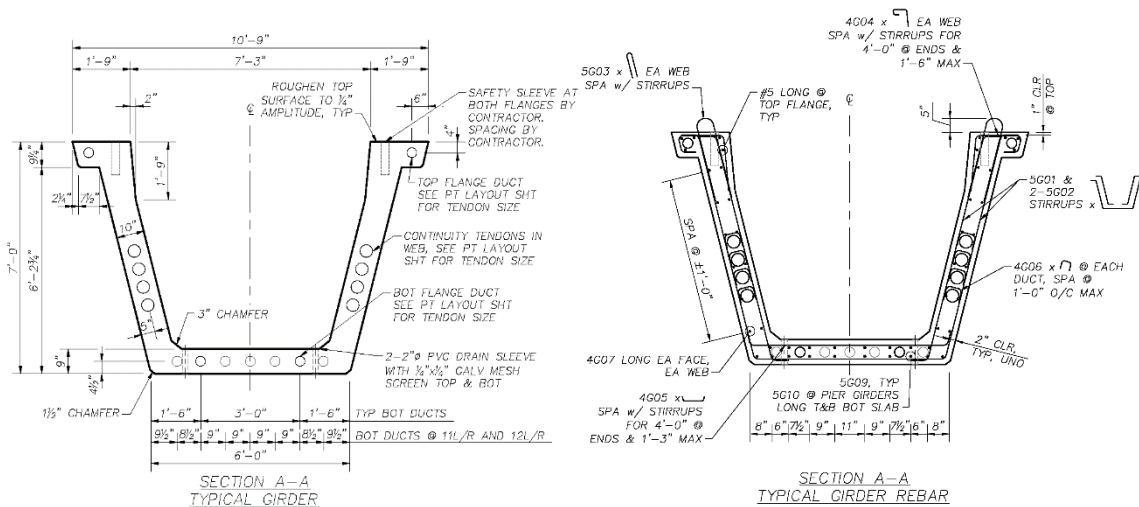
Precast Girder Details – Typical Section and Reinforcement
